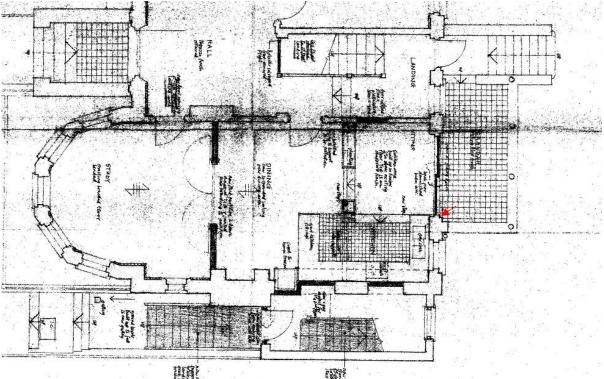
Proposed ground floor plan extract, 1981, showing the former porch arrangement.
